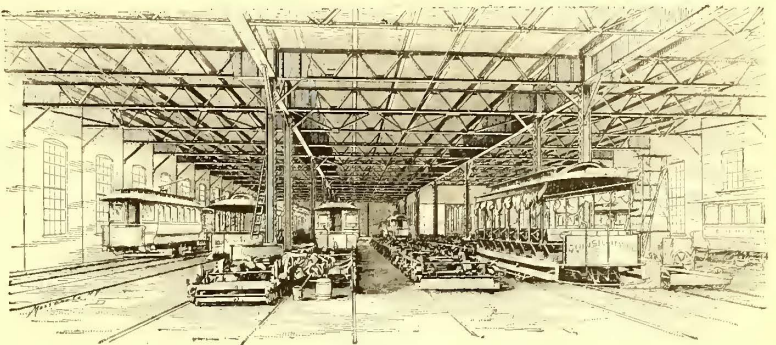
FIRST FLOOR OF CAR HOUSE—WORCESTER TRACTION CO.
